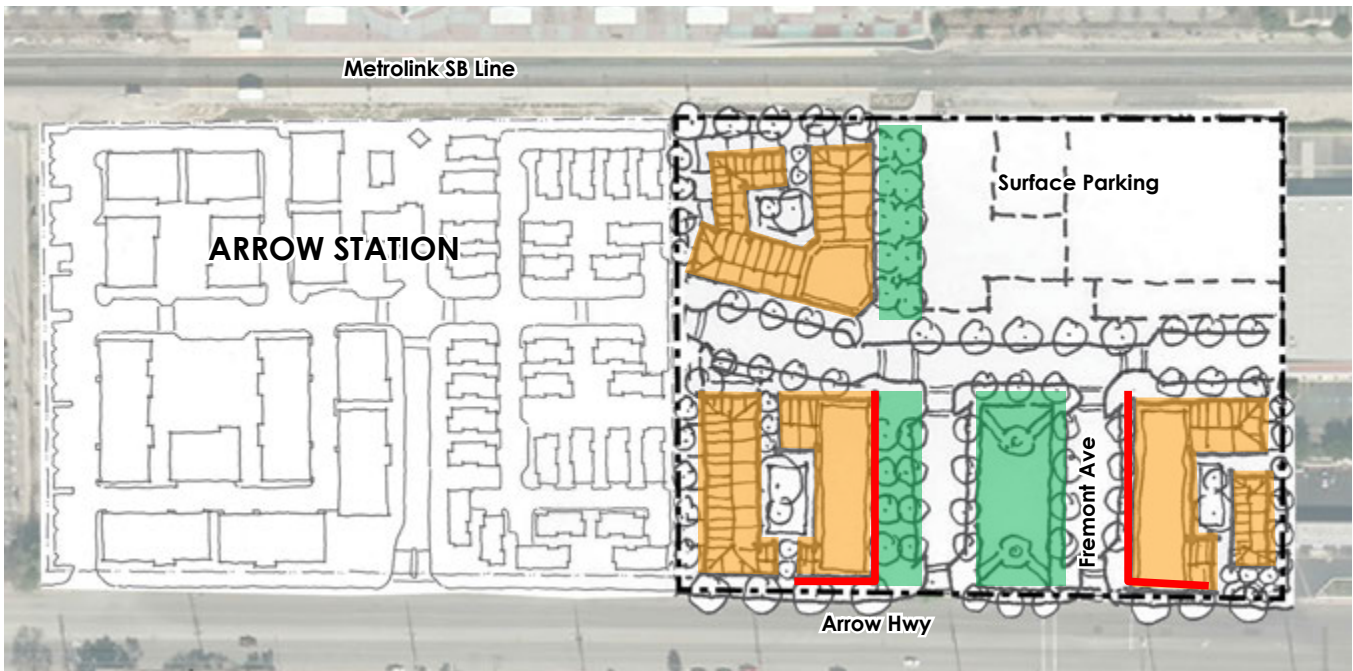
ILLUSTRATIVE SITE PLAN CONCEPT ALTERNATIVE B-1 SOUTH OF THE METROLINK TRACKS
